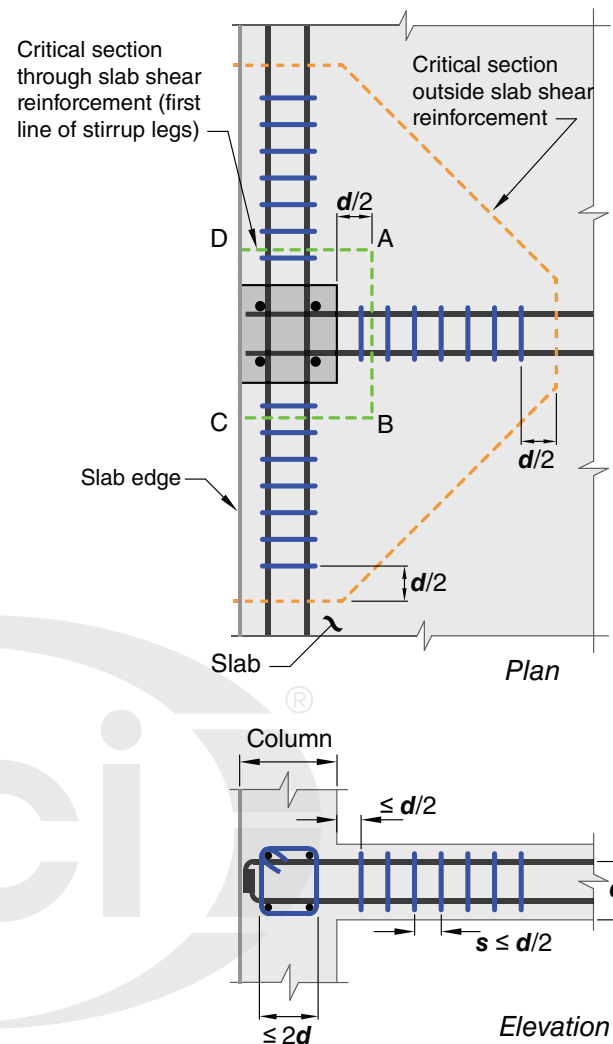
(f)—Arrangement of stirrup shear reinforcement, edge connection.
